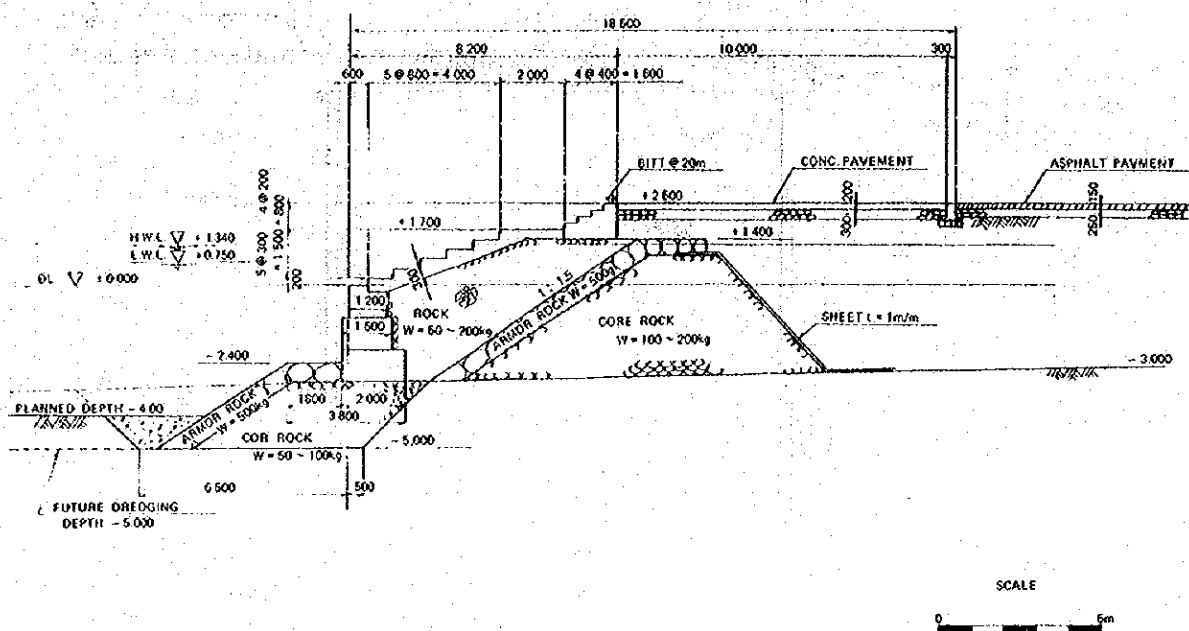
Cross Section of Stair Landing – Iloilo Port
